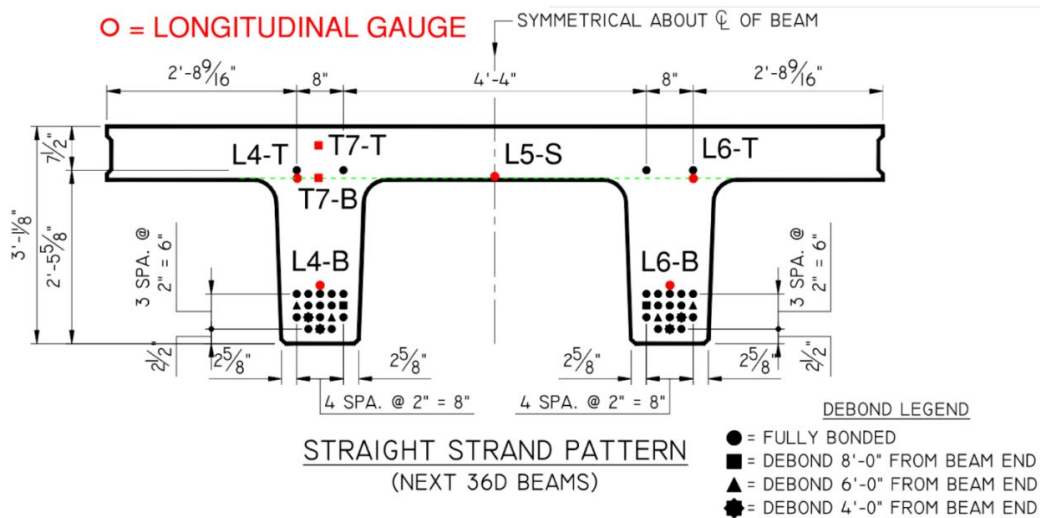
NEXT Beam Section RB2-2 Instrumentation Plan
